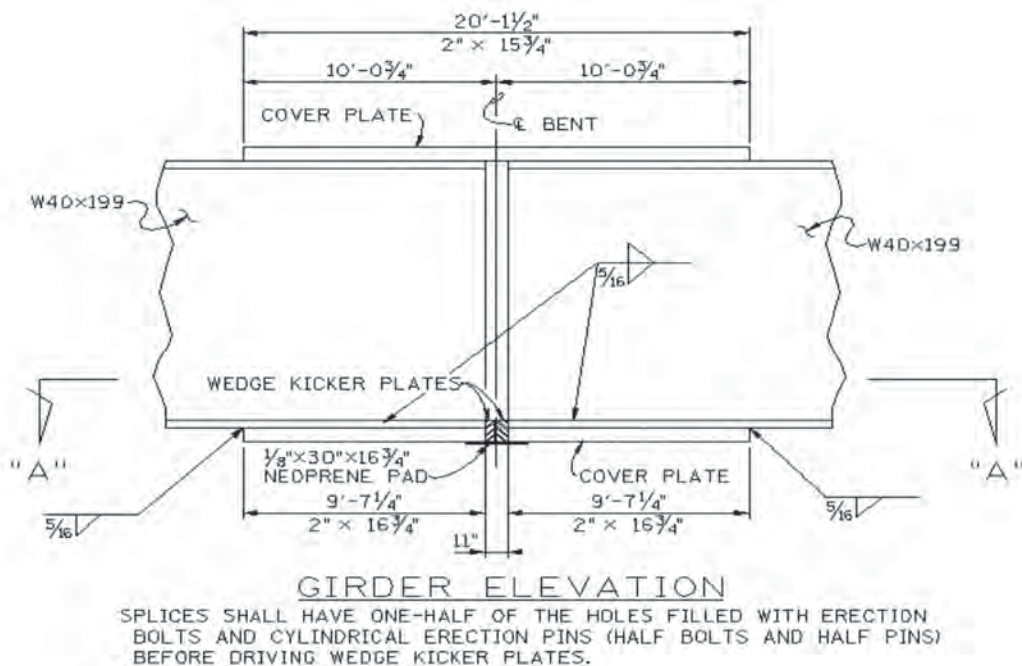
Second detail for an SDCL steel bridge system, used for the DuPont Access Road Bridge in New Johnsonville, Tennessee.
